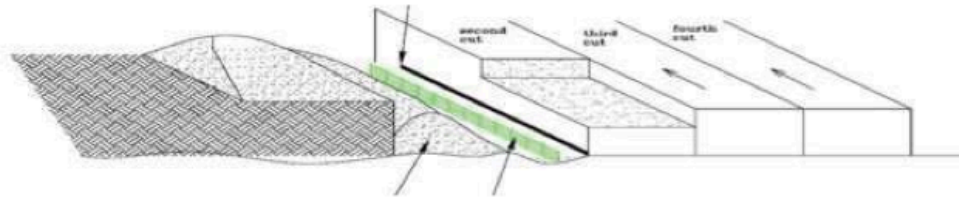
Continue digging trenches, backfilling empty trenches, and stockpiling gravel for washing, until the area has been fully worked
